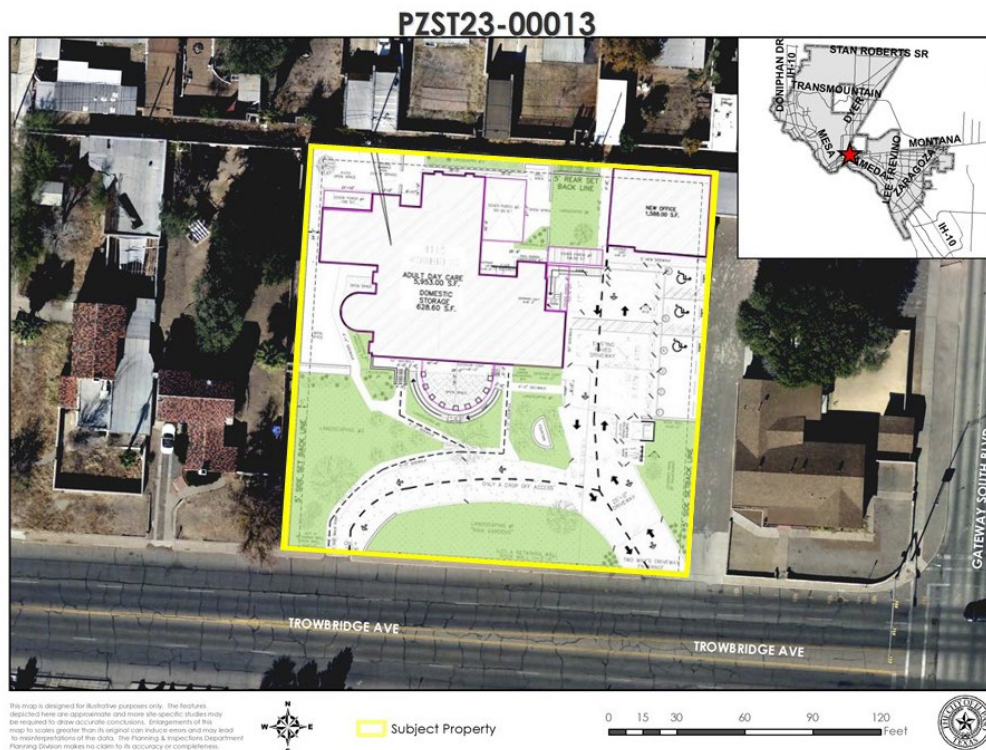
Figure A. Detailed Site Development Plan Superimposed on Aerial Imagery.
